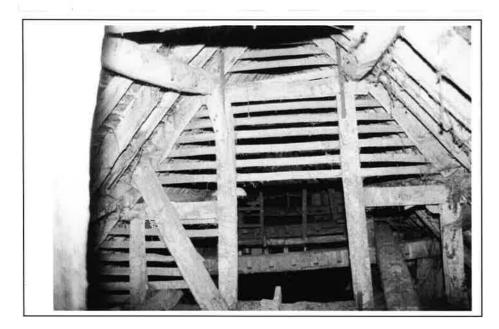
North face of truss 6 in 'Brewhouse' showing widely-spaced laths
